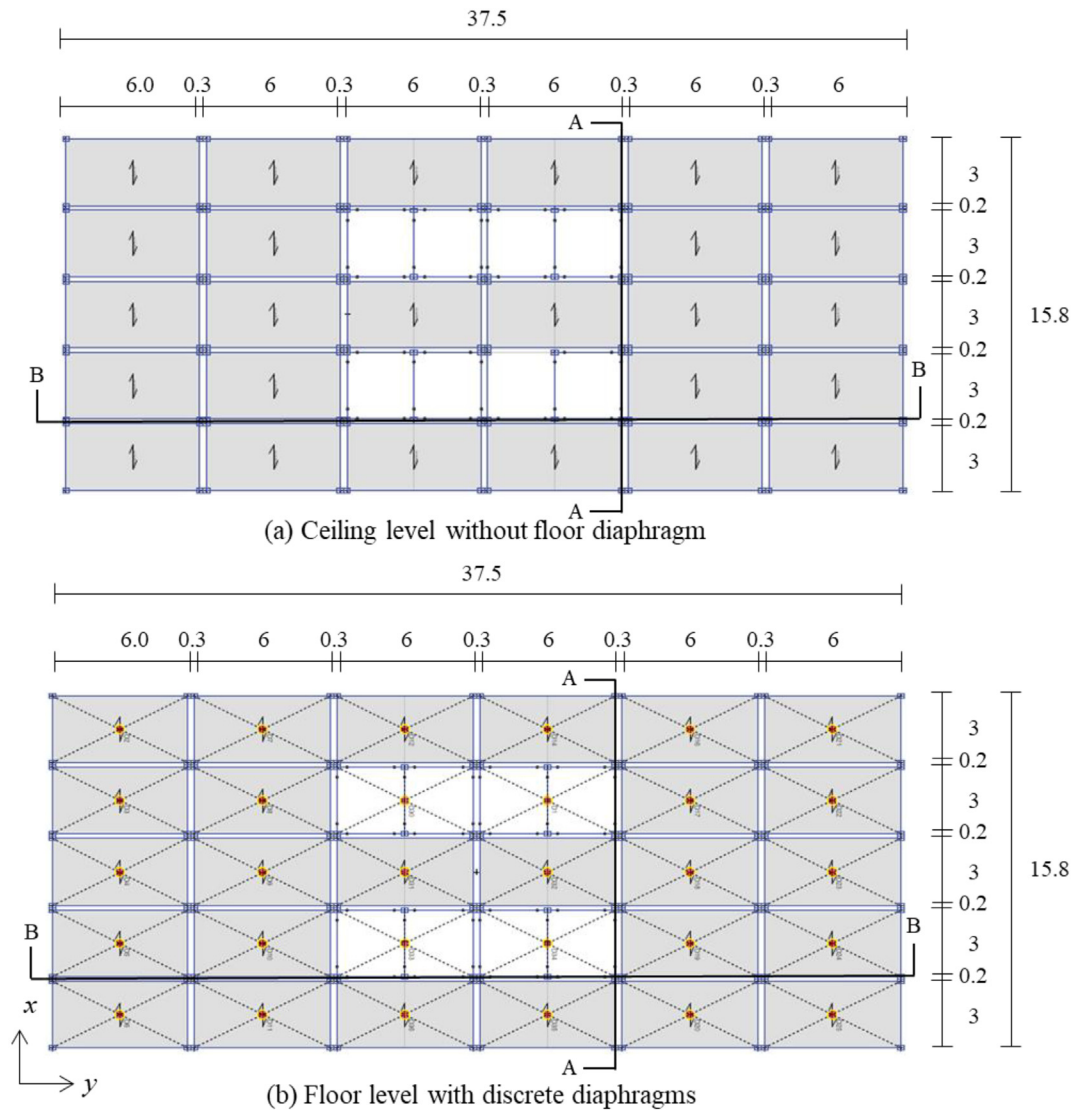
Plan view of 10-storey modular building with central braced modules (a) ceiling level, and (b) floor level (all units in m).
